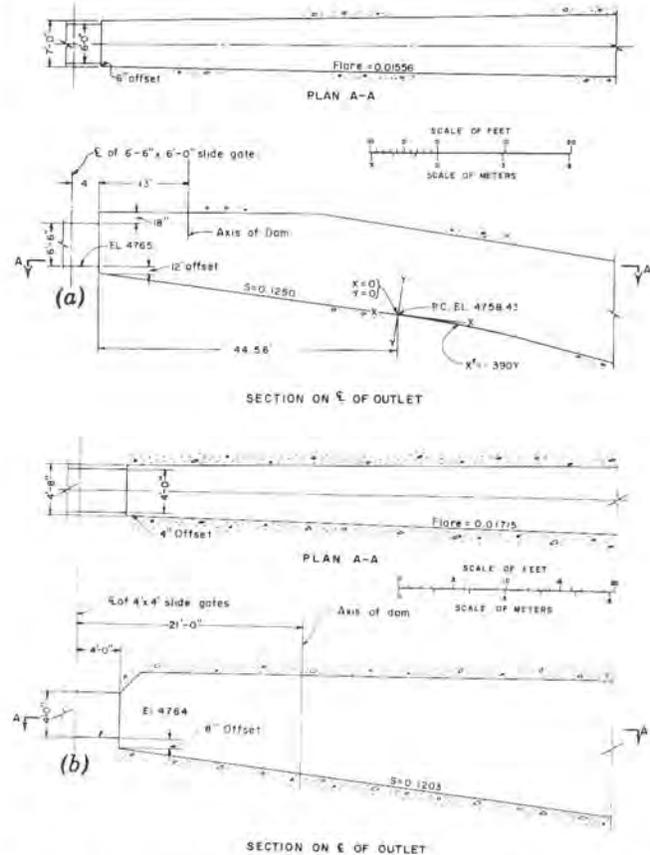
Pueblo Dam Recommended Outlet Works: (a) Spillway Outlet Works; (b) River Gorge Outlet Works
